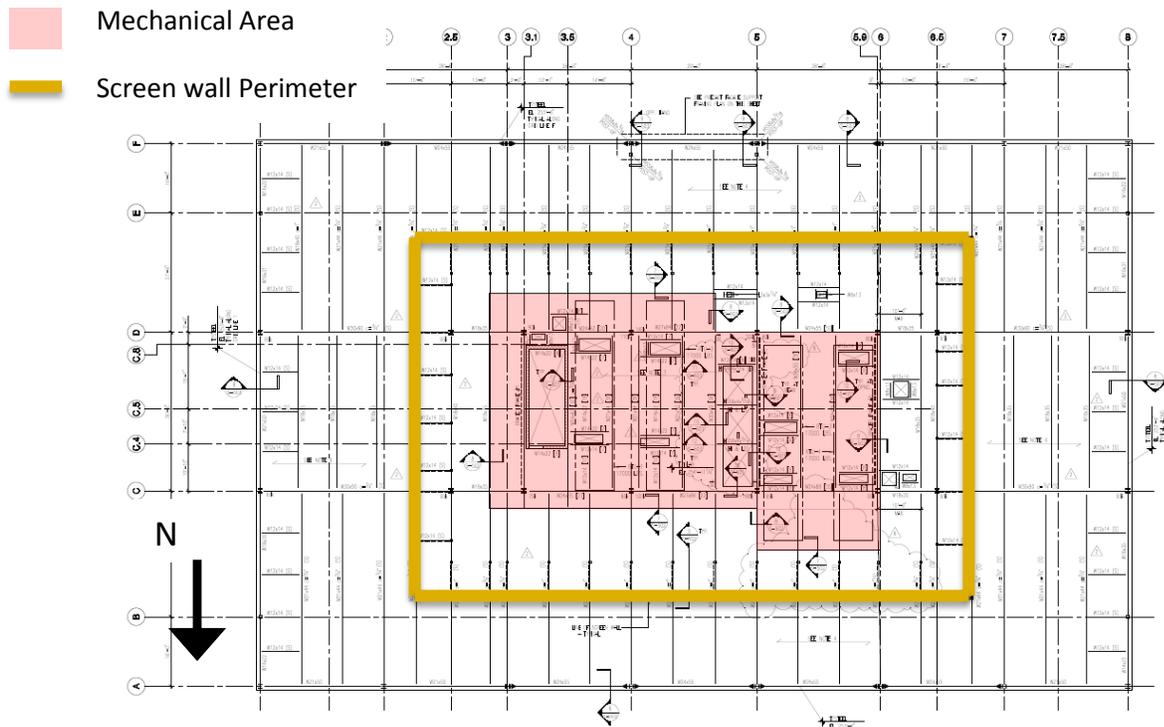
Structural Roof Plan (Source: Cagley & Assoc. Drawing S-209)
